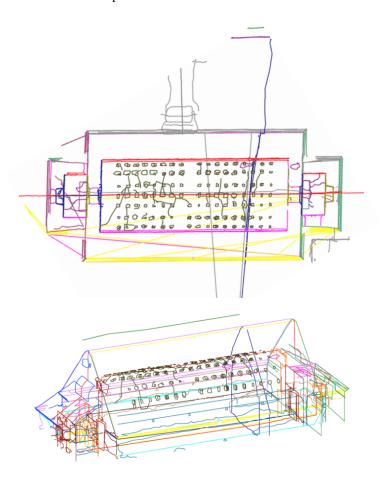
Image showing layer of floor plan and 3D model (Source: WCLA modified by authors)
